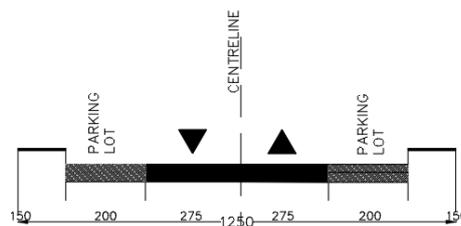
Standard cross section of the F category road according to D.M. 6792/2001³.
